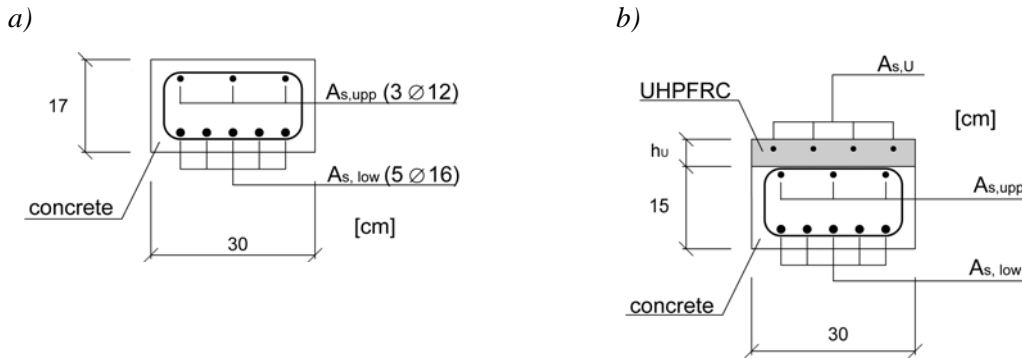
a) Section of the concrete substrate, b) section of the composite element
